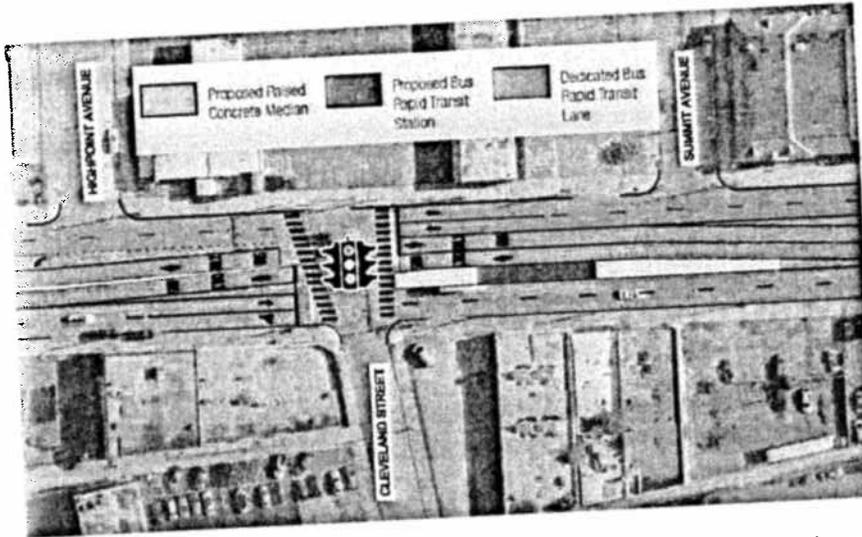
The location of the proposed BRT station and raised concrete median extended beyond Summit Avenue.
